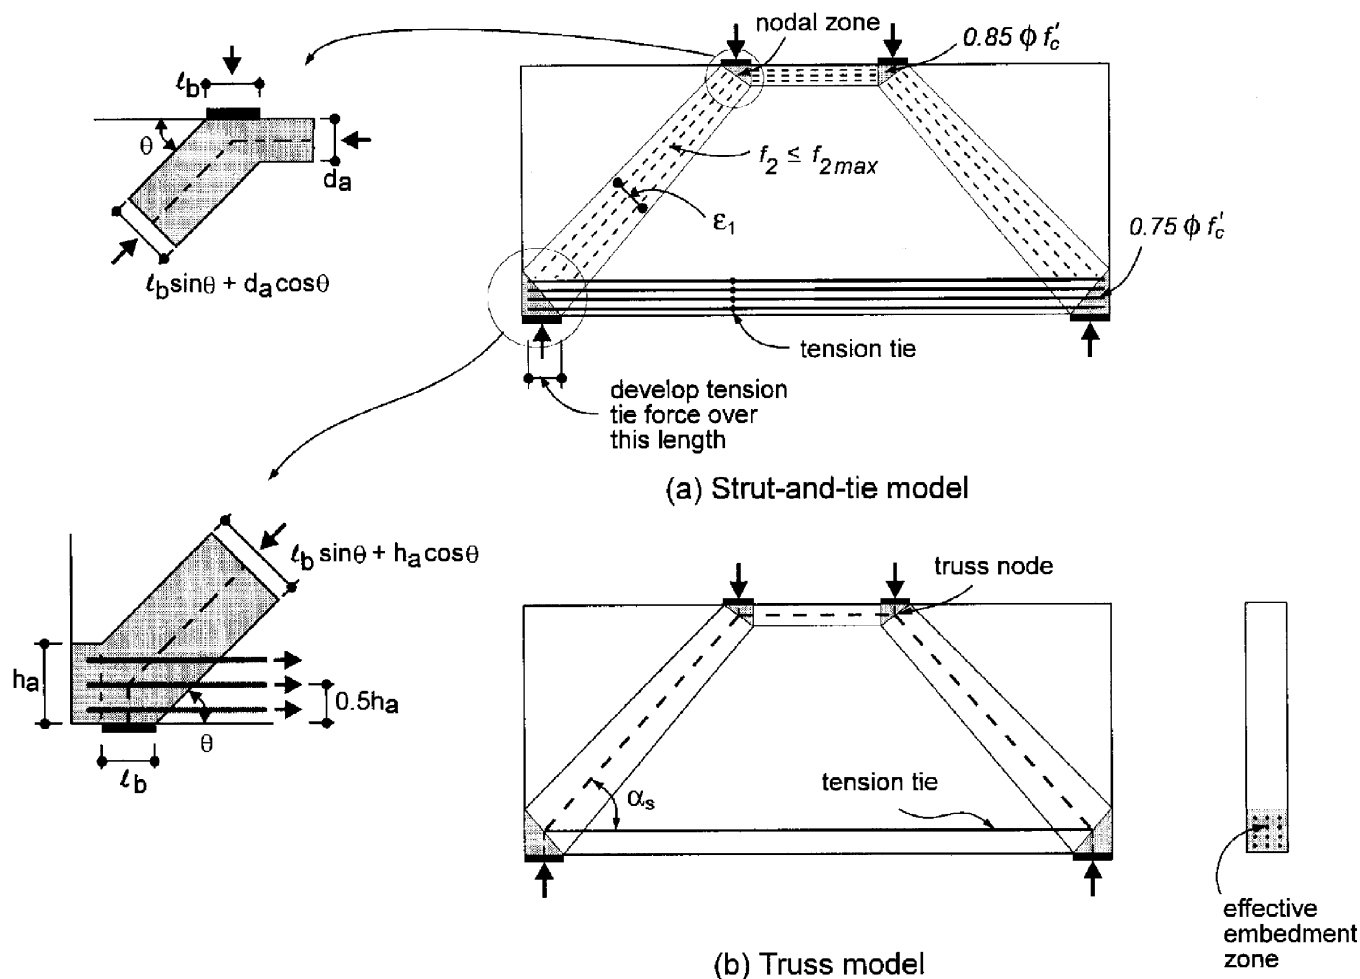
Strut-and-tie model and idealized truss model for deep beam.
